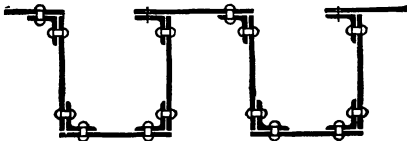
Trough-Floor Construction for Easy Field Riveting.
